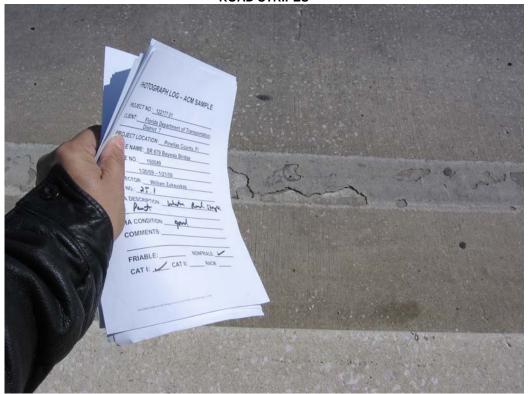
01/21/09 - SAMPLE 25.1 - HA 25 WHITE PAINT ROAD STRIPES
